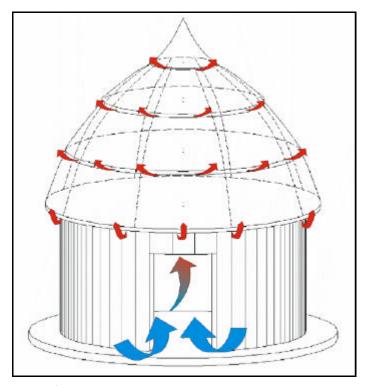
Schematic illustration of the ventilation concept in a dwelling house
